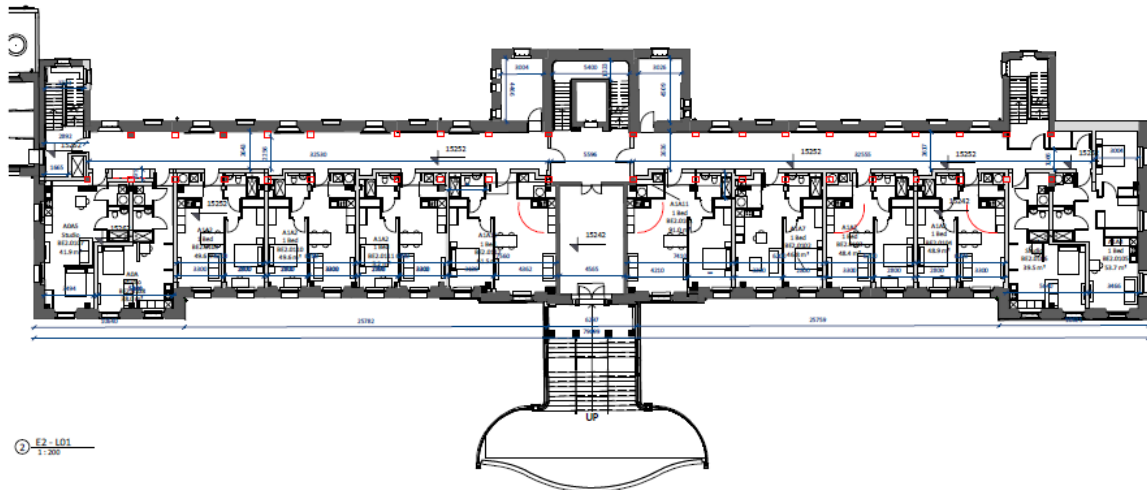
Extract from the intervention/proposal plan for Main College Building/Seminary by OMP Architects showing the overall single-banked layout retained with new residences facing over the front lawn.
